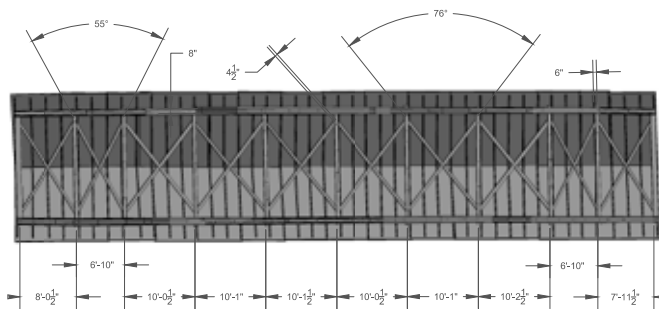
Dimensioned 3D AutoCAD ceiling image of the Imes Bridge (NRR).
